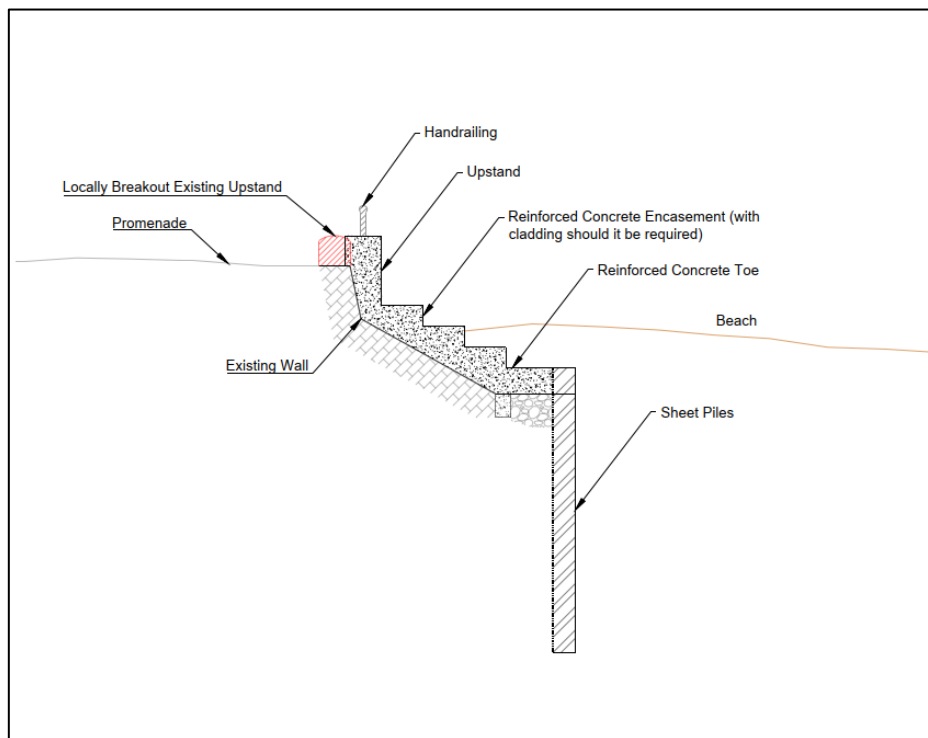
Concept sketch of Seawall Encasement Option (cross section will vary subject to existing wall geometry).
